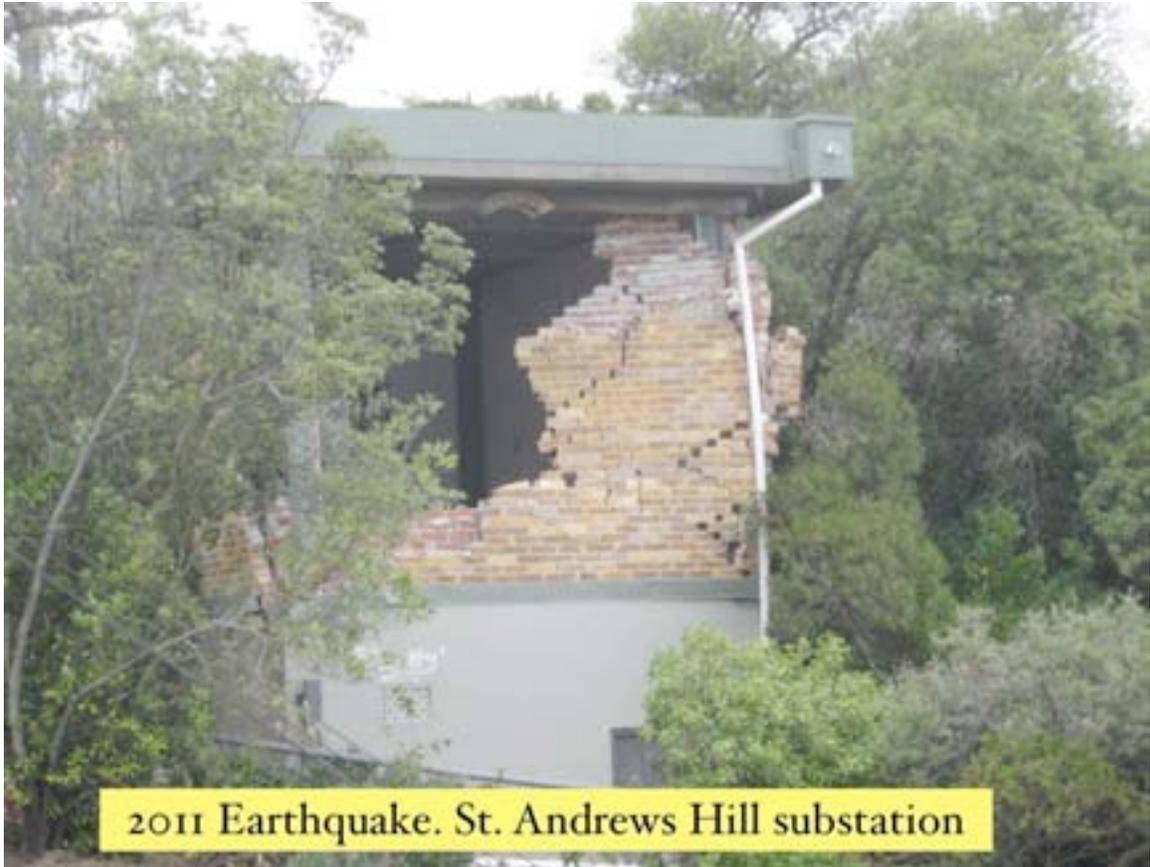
Failure of Upgraded URM Substation, Feb 22 2011
